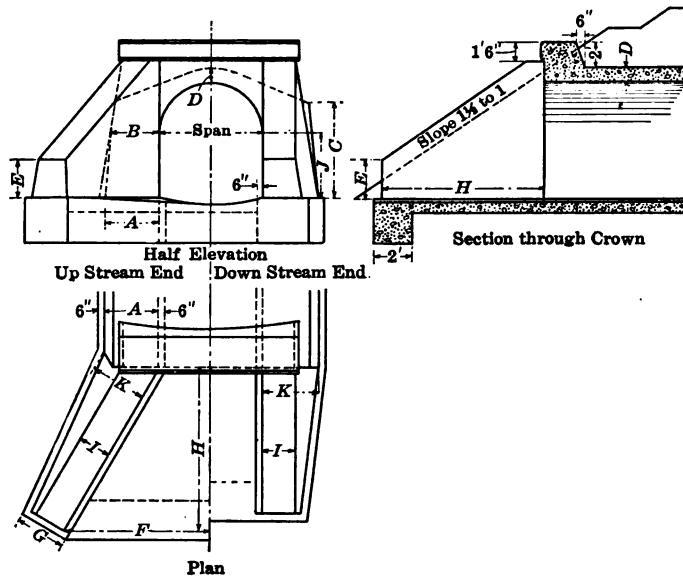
Erie Railroad Standard Plain Concrete Arch Culverts.
